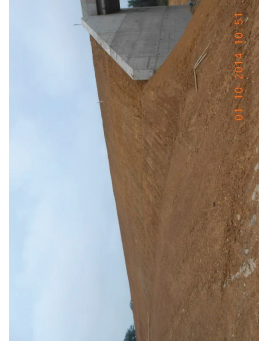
(Before): Exposed slope has yet to be protected (relocation road near bridge).
